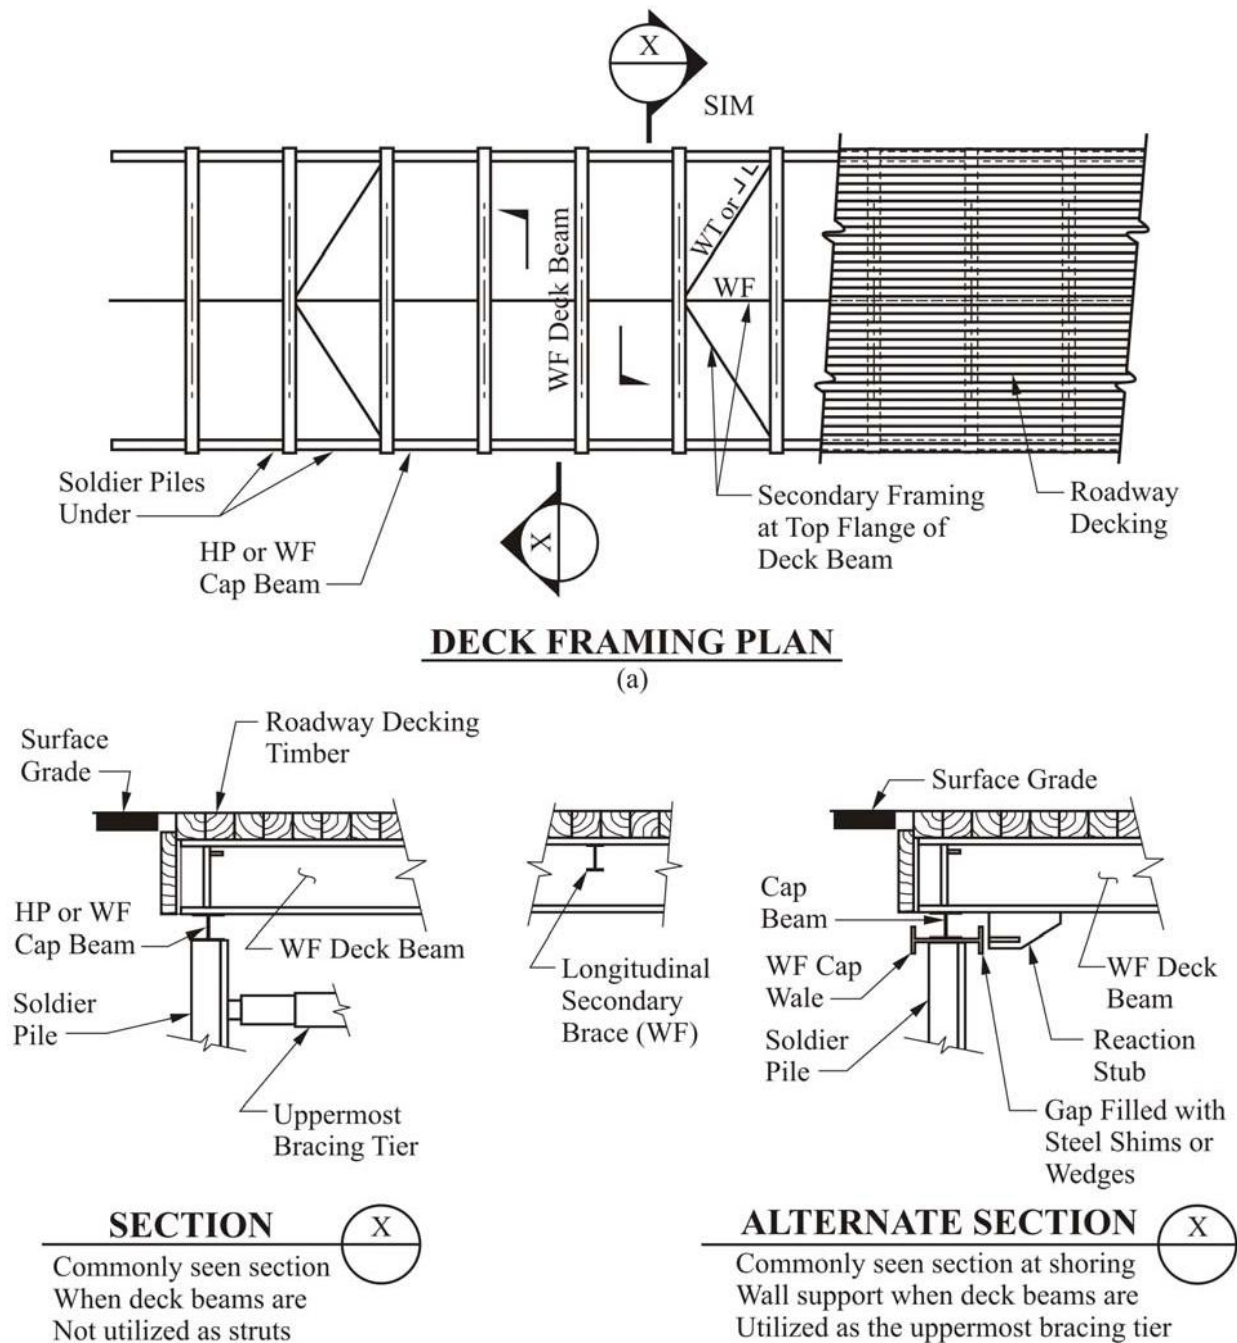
Typical Street Decking (After Bickel et al., 1996)
